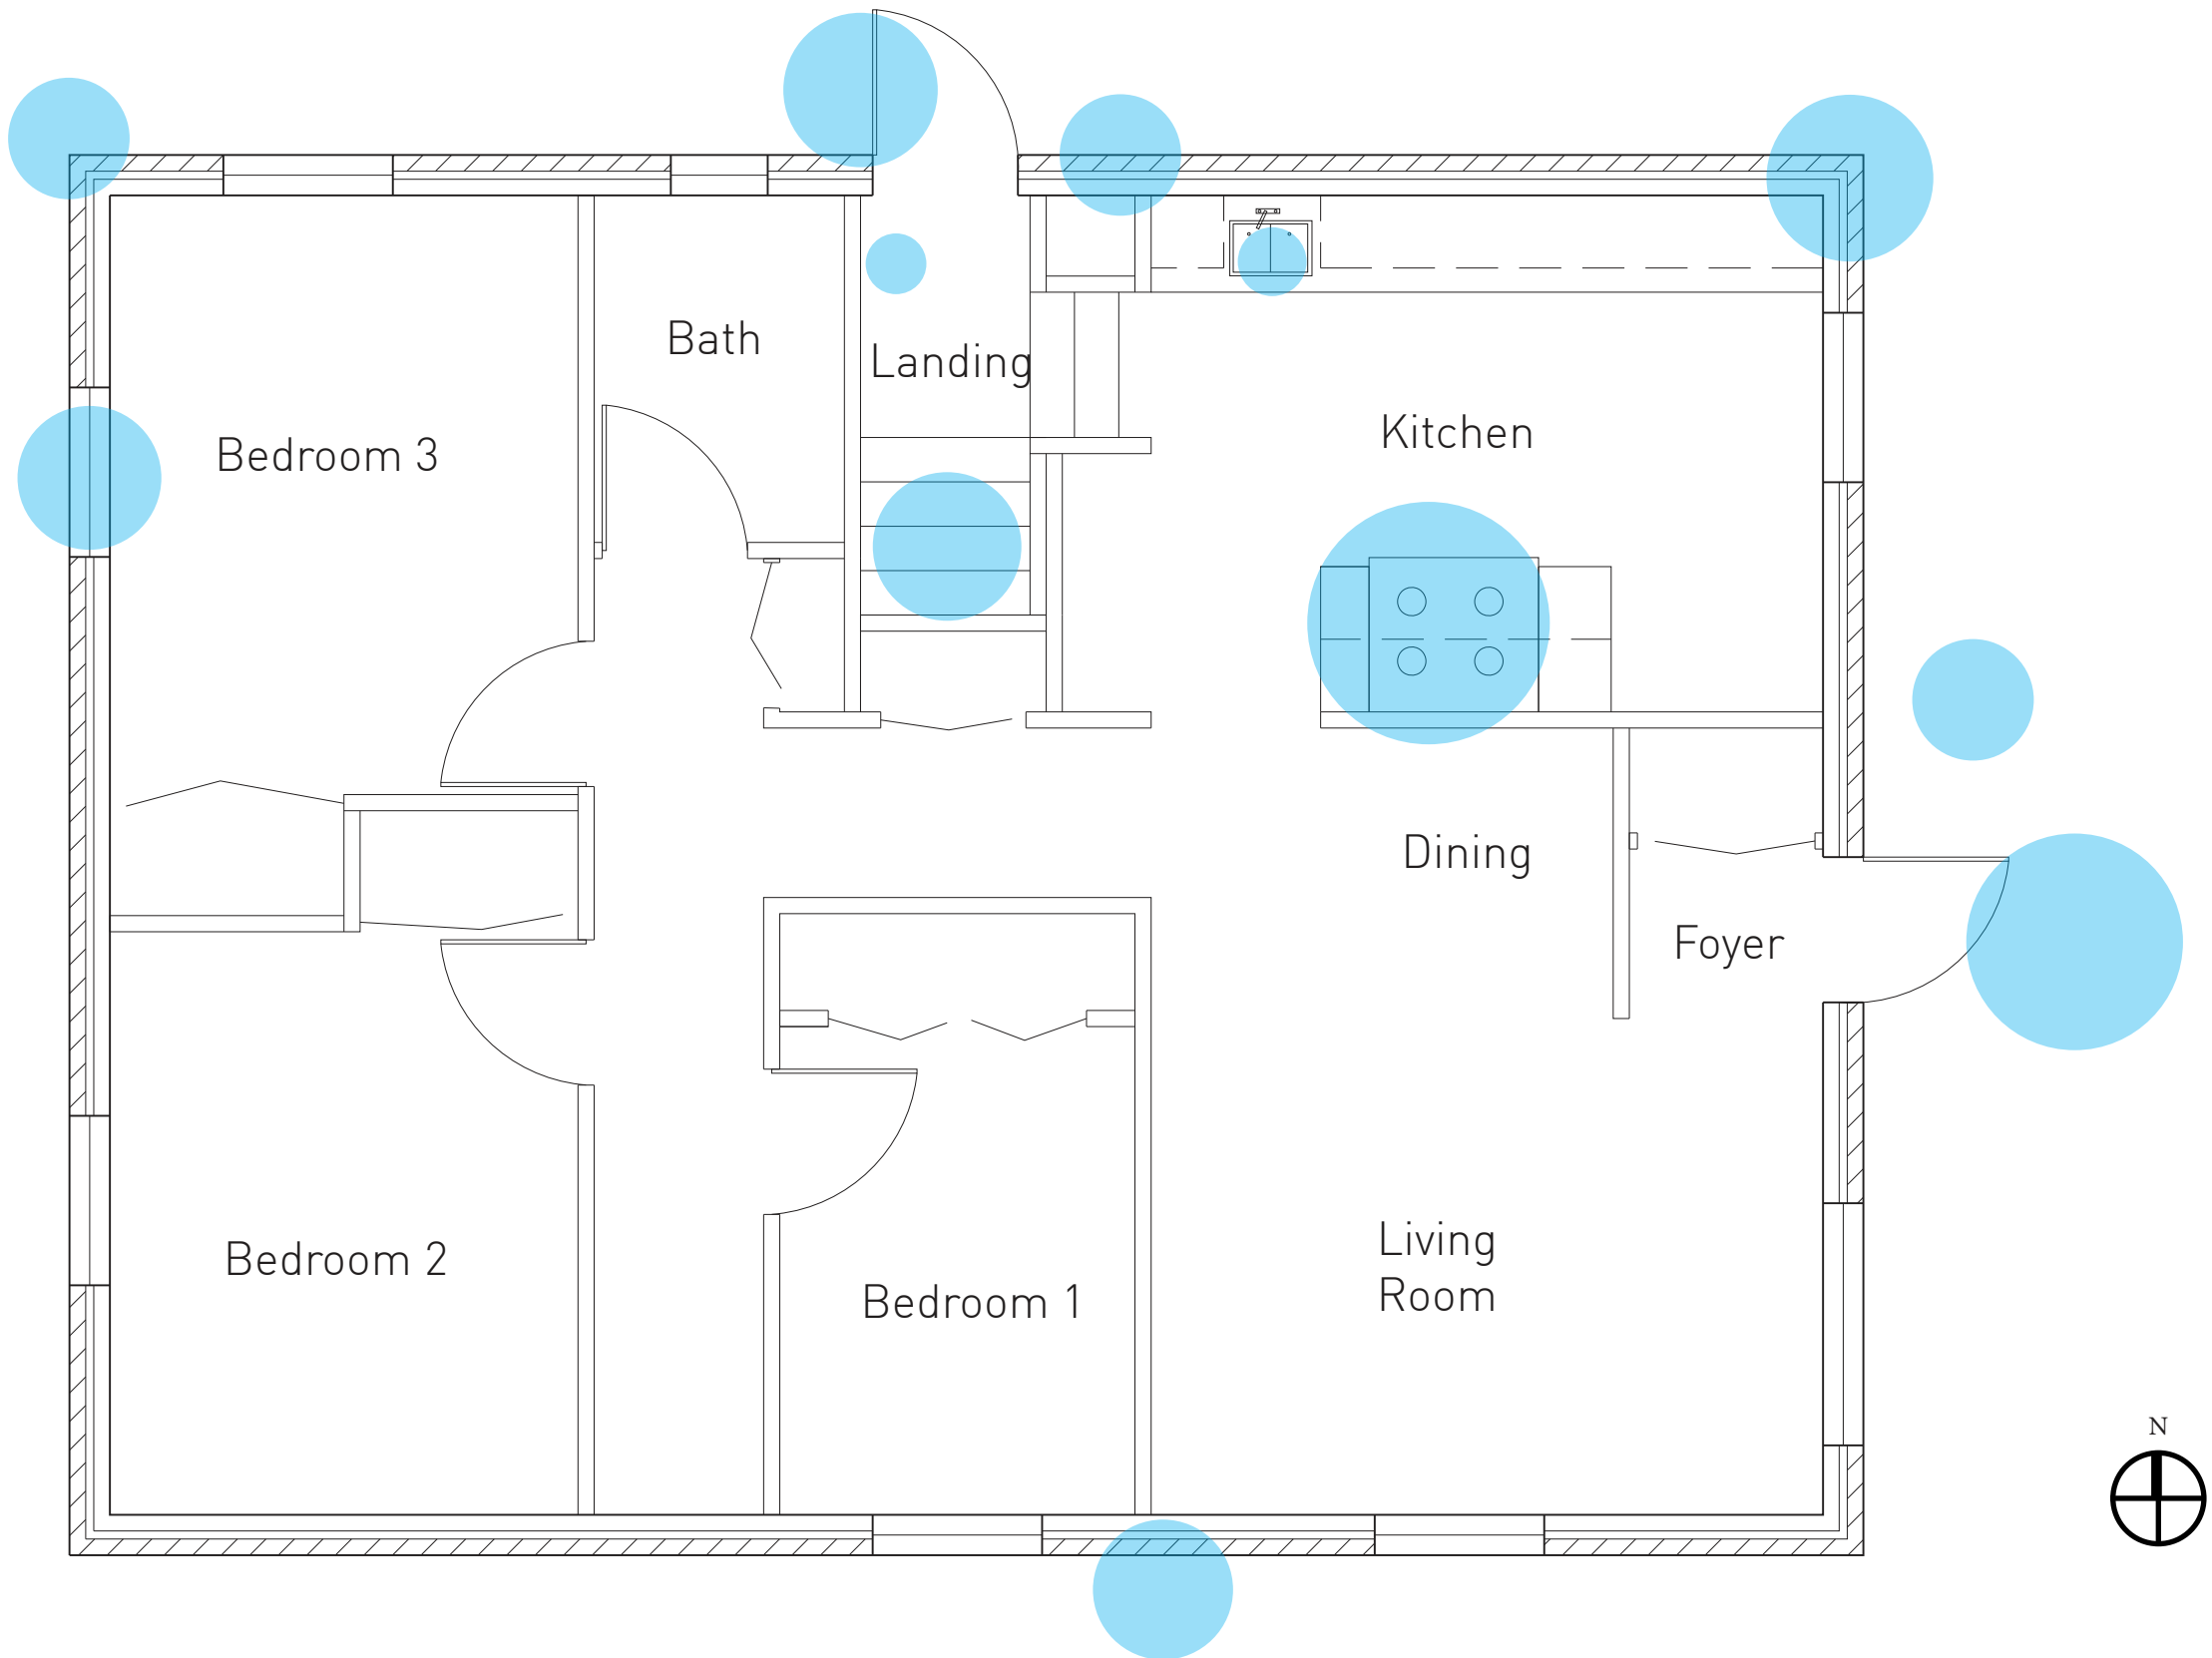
Floor plan with call-outs to areas of interest within the home
